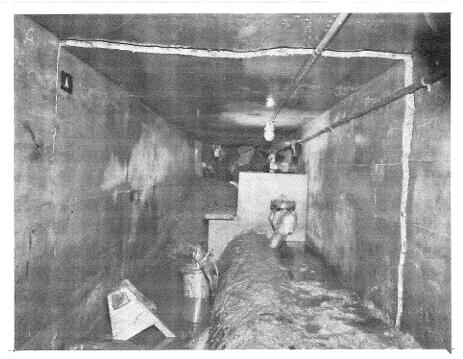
Drainage inspection chamber, showing crack at Station 0+70.3, December 20, 1963.
